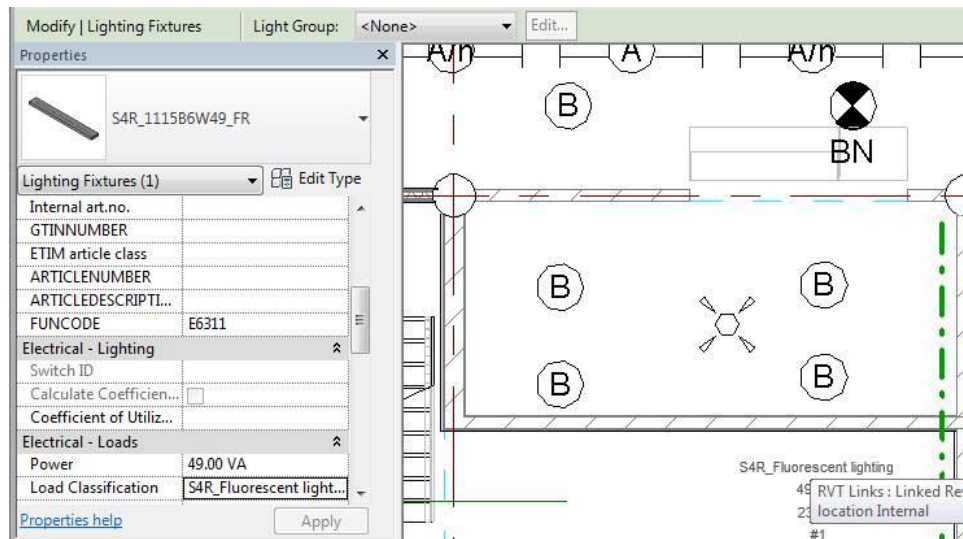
example of a lighting plan, including properties and electrical power load of an armature.
